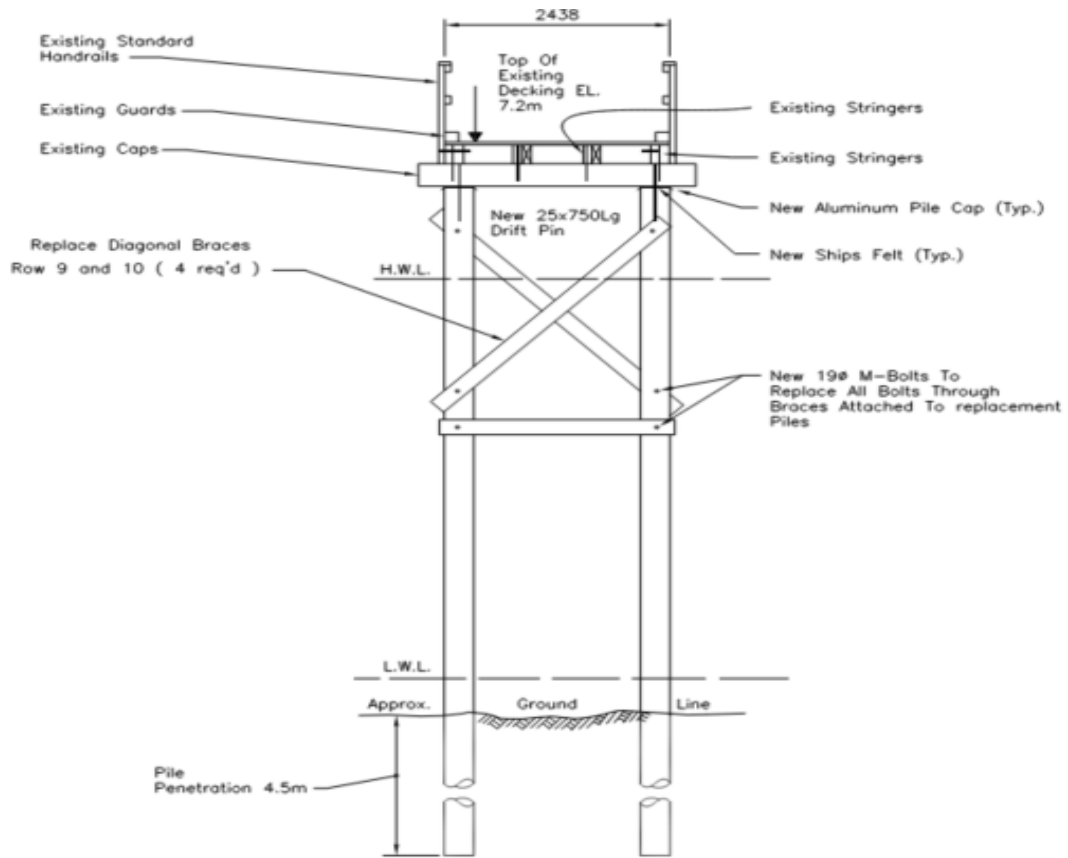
Typical Structure Cross Section (Abutment to Bent No. 13)
